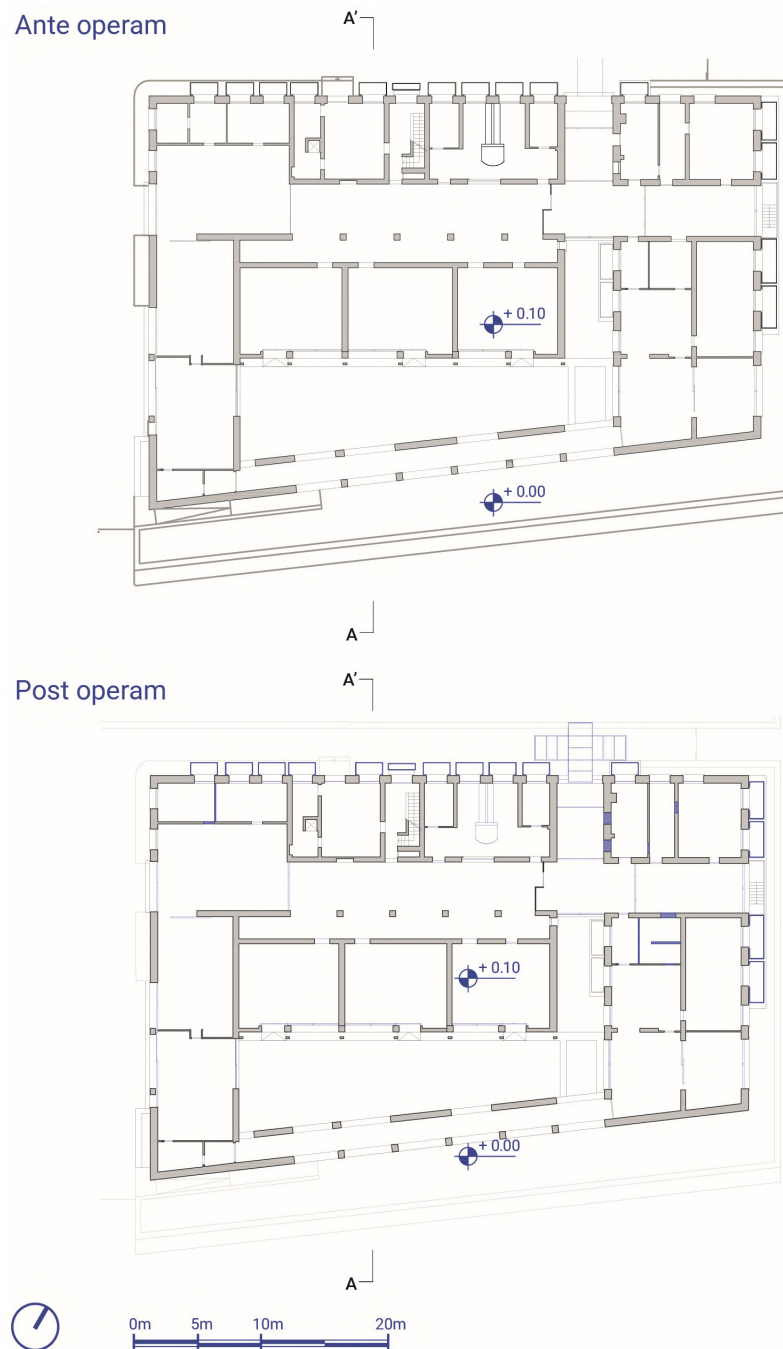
Original and current floor plan configurations of the former Olivetti nursery school, with transformations highlighted in blue. Source: elaboration by the authors.
